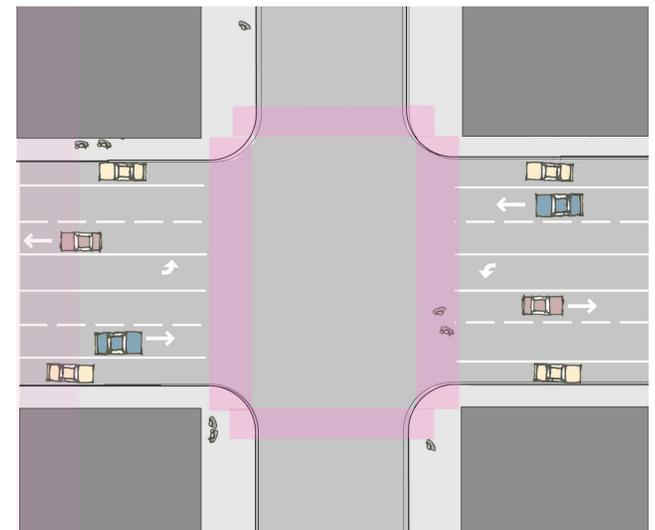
PLAN VIEW OF EXISTING CORRIDOR INTERSECTION
